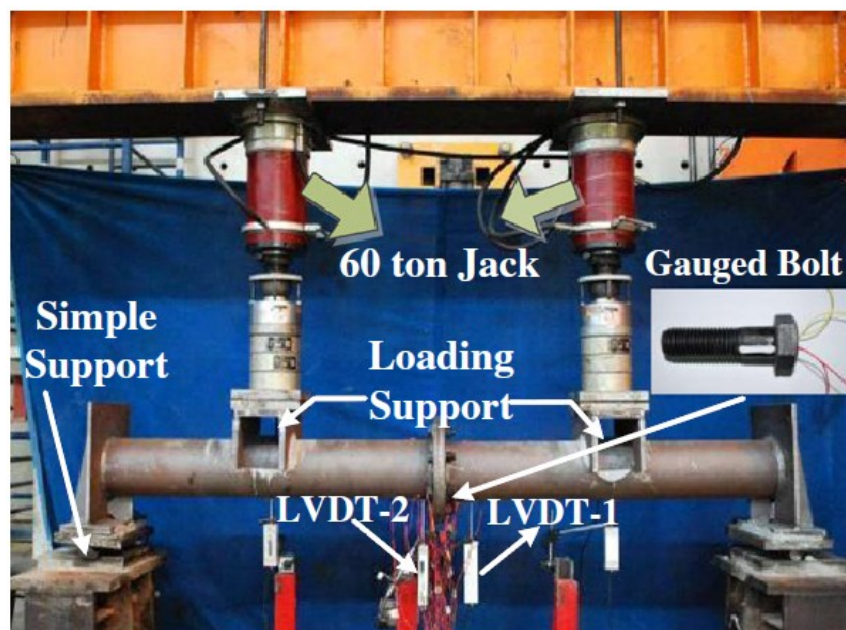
Experimental setup for eight-bolt unstiffened steel flange-plate connection splicing two circular hollow sections under pure bending [17]
